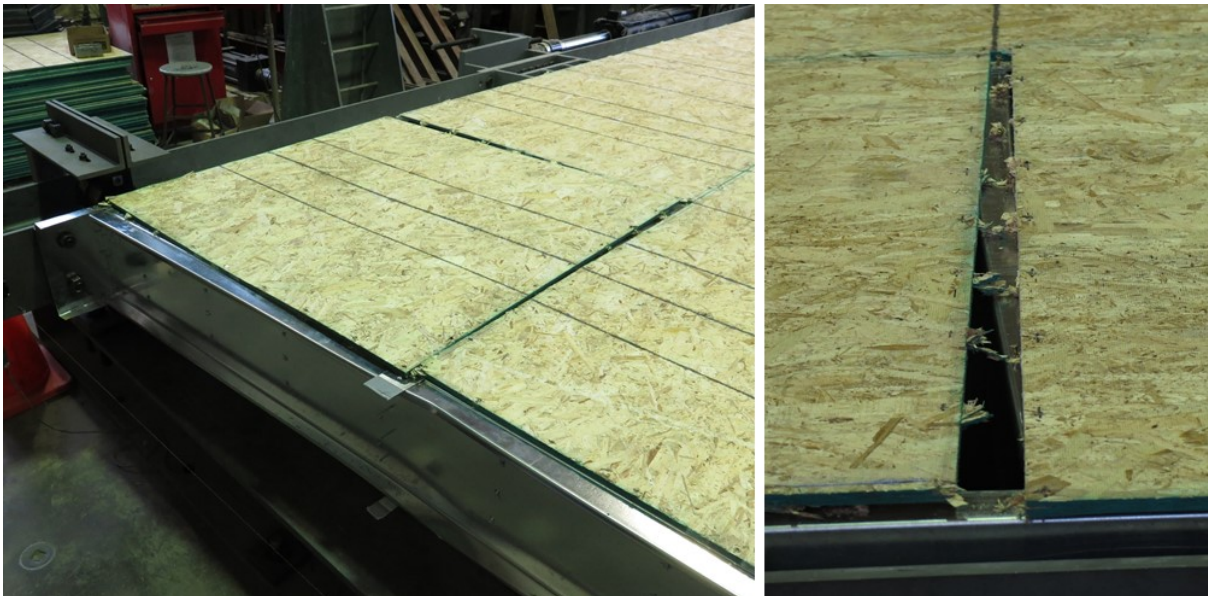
(Left) Isolation of South-West Corner Panel of 12-RSTRAP-M (Right) Close Up of Tear-out Fastener Failures
